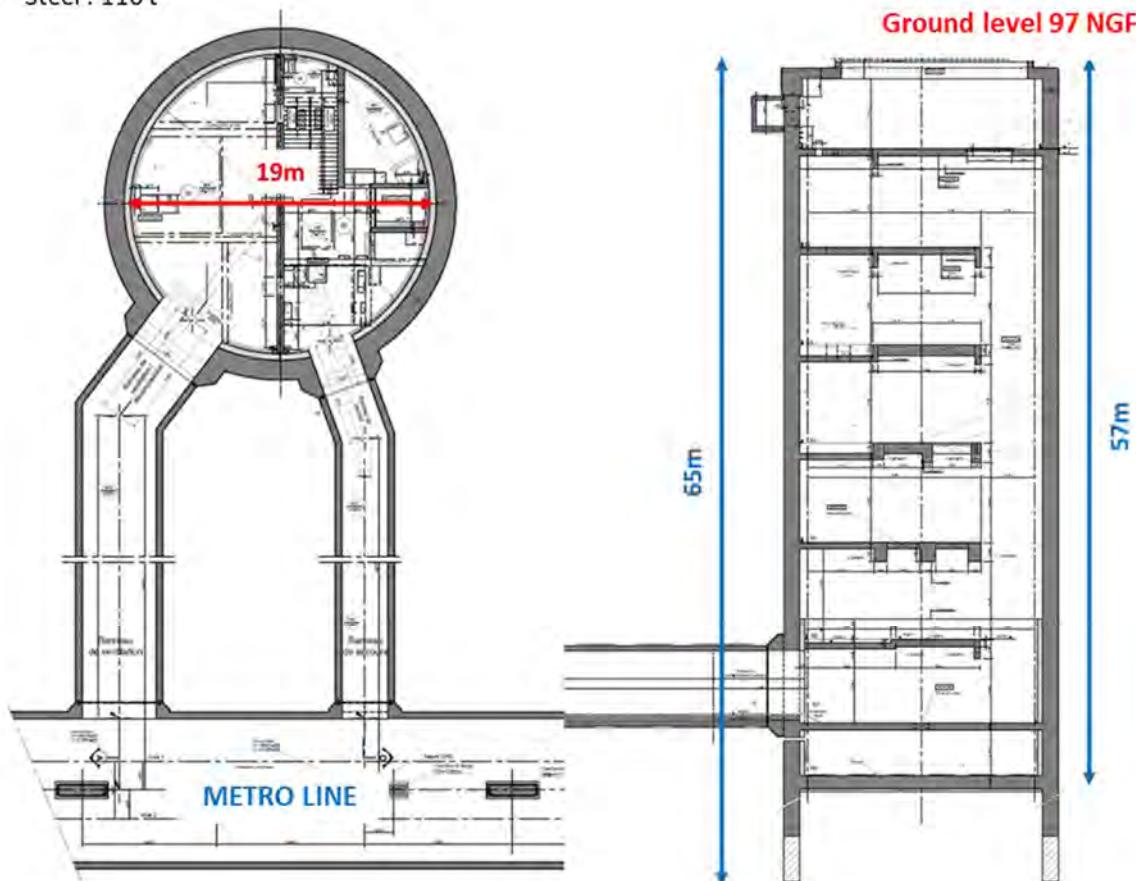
Plan view and cross section of the 2 galleries connecting the 1501P to the metro line 15 -
